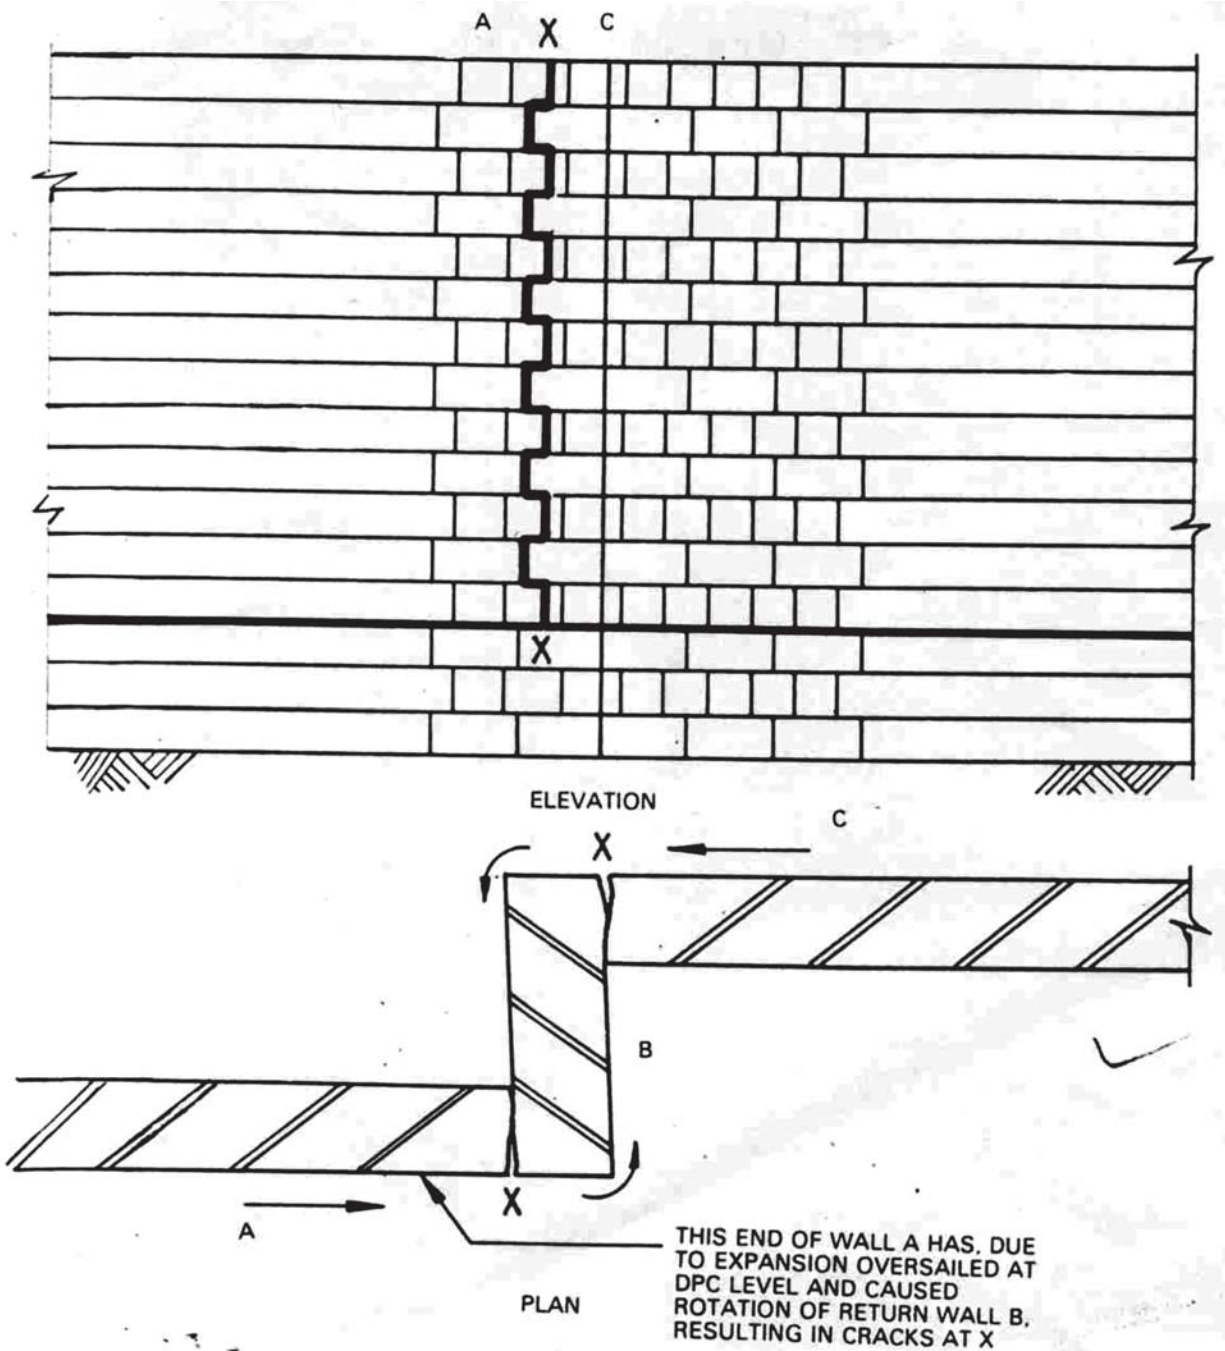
Cracking due to Expansion of Brickwork (Ref : SP25 (S&T) 1984)
